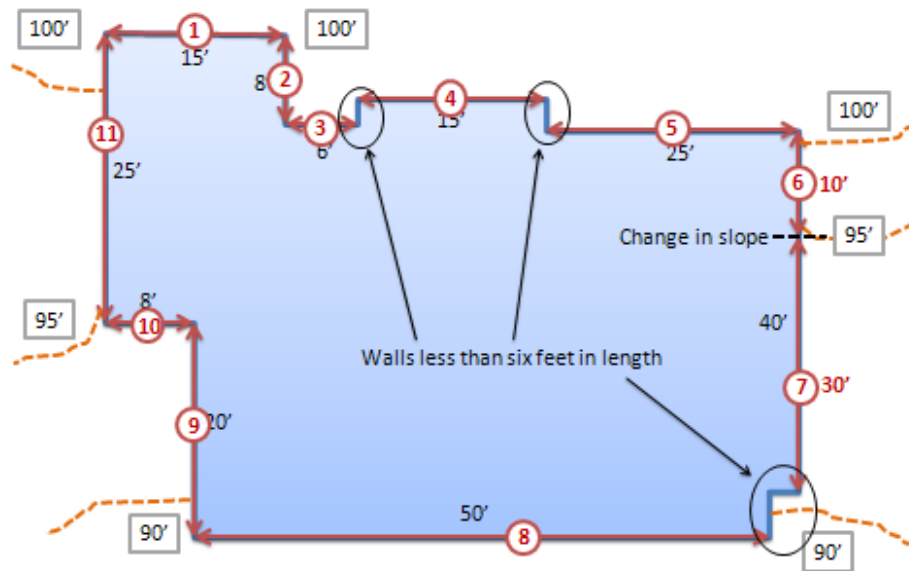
shows the plan view again. Each wall of greater than six feet has been divided into numbered segments (in red) totaling eleven. Walls of less than six feet have been exempted. Segments six and seven occupy the same wall, but represent two segments of differing slopes and are therefore averaged separately (see Figure 8, above).
